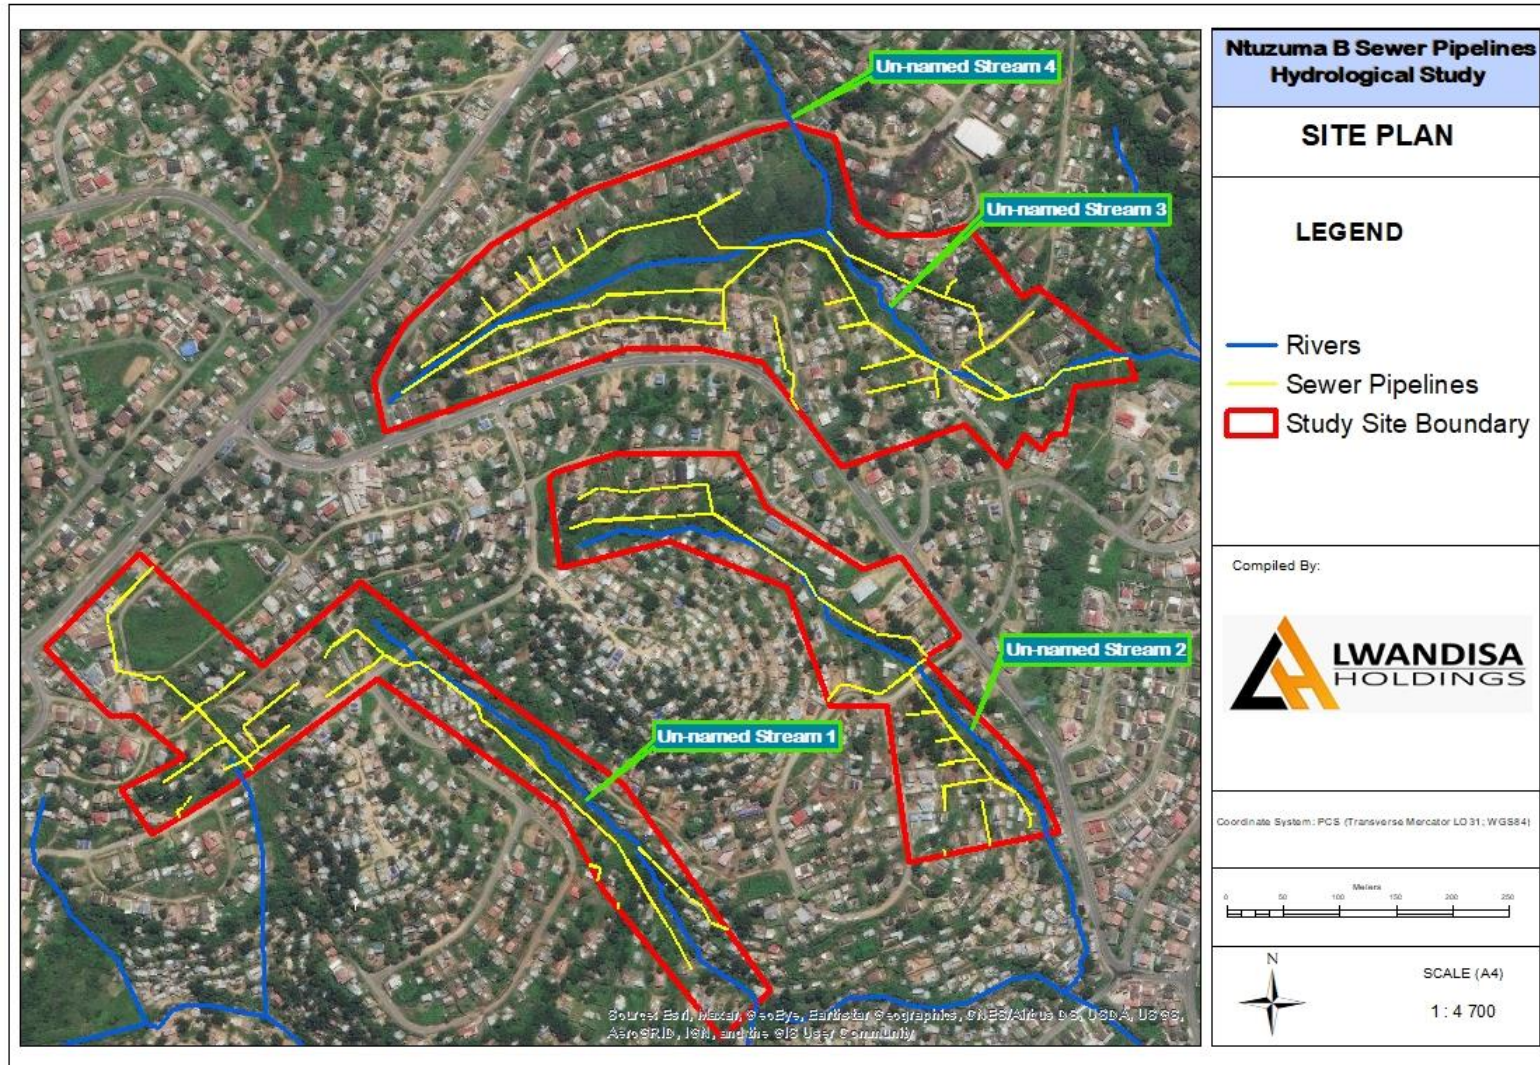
Site Plan for the Proposed Ntuzuma B Sewer Pipelines Hydrological Study
